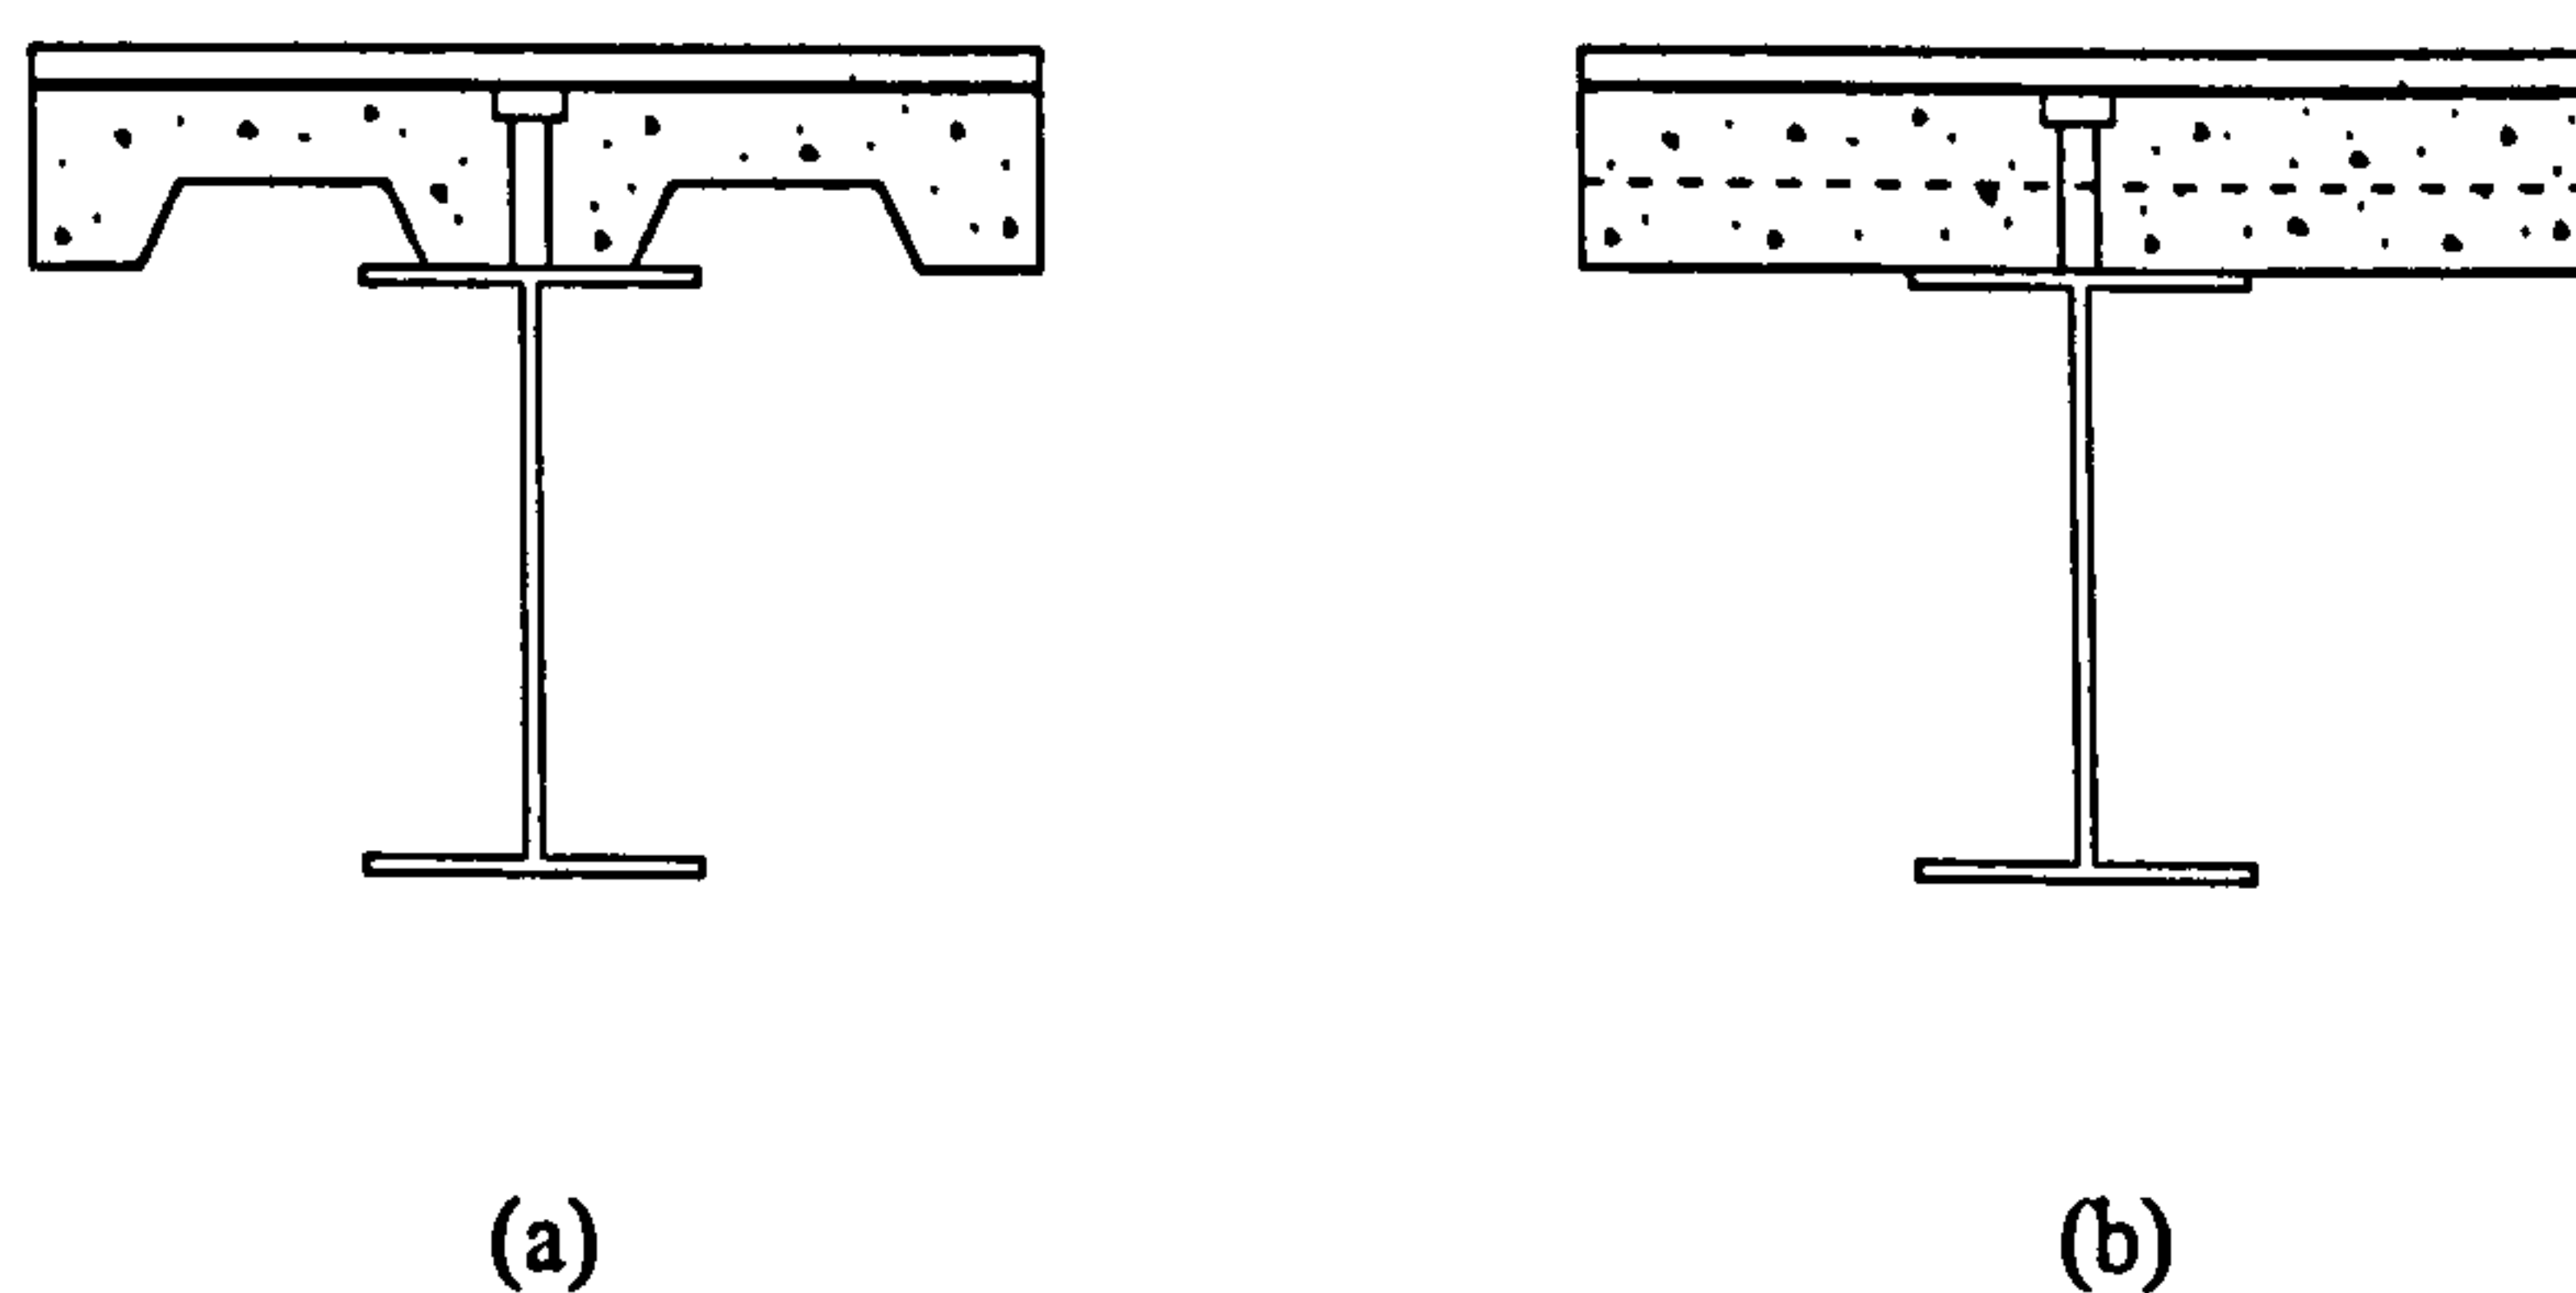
Composite beam sections with profile steel decking: (a) deck parallel to steel beam, (b) deck perpendicular to steel beam
